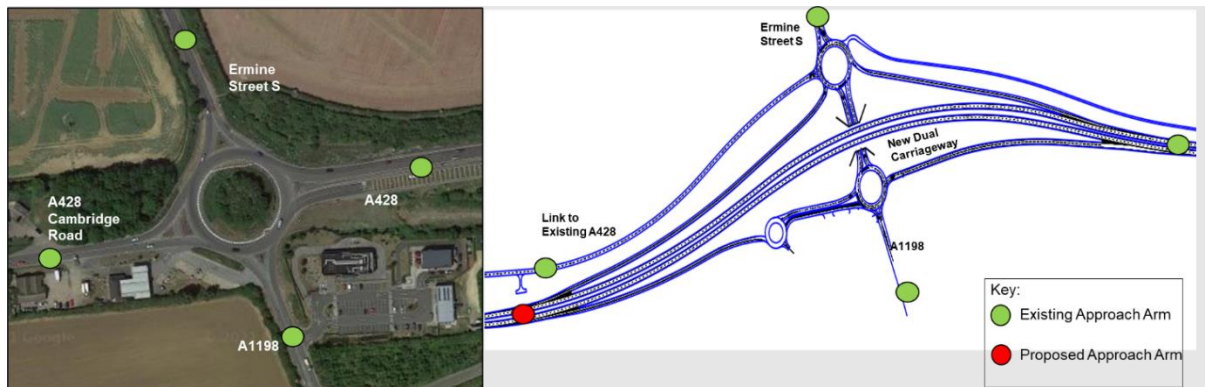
Origin/ Destinations at existing and proposed Caxton Gibbet Junction
